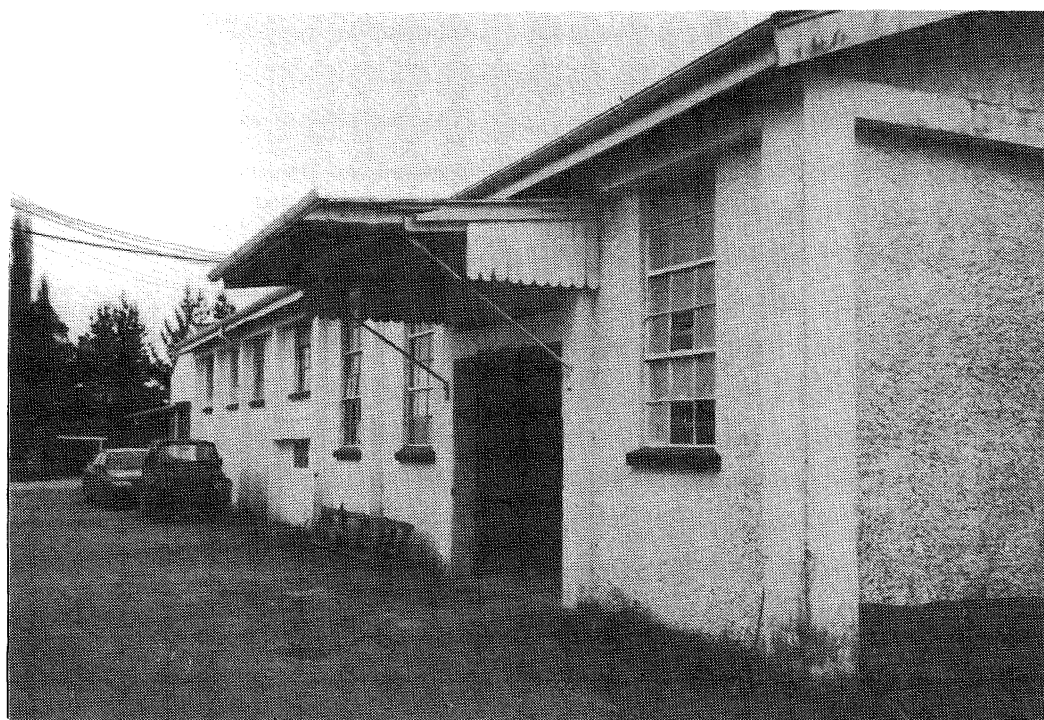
Dairy factory, Murchison, reinforced concrete, undamaged due to having large amounts of structural wall and symmetry in plan.
